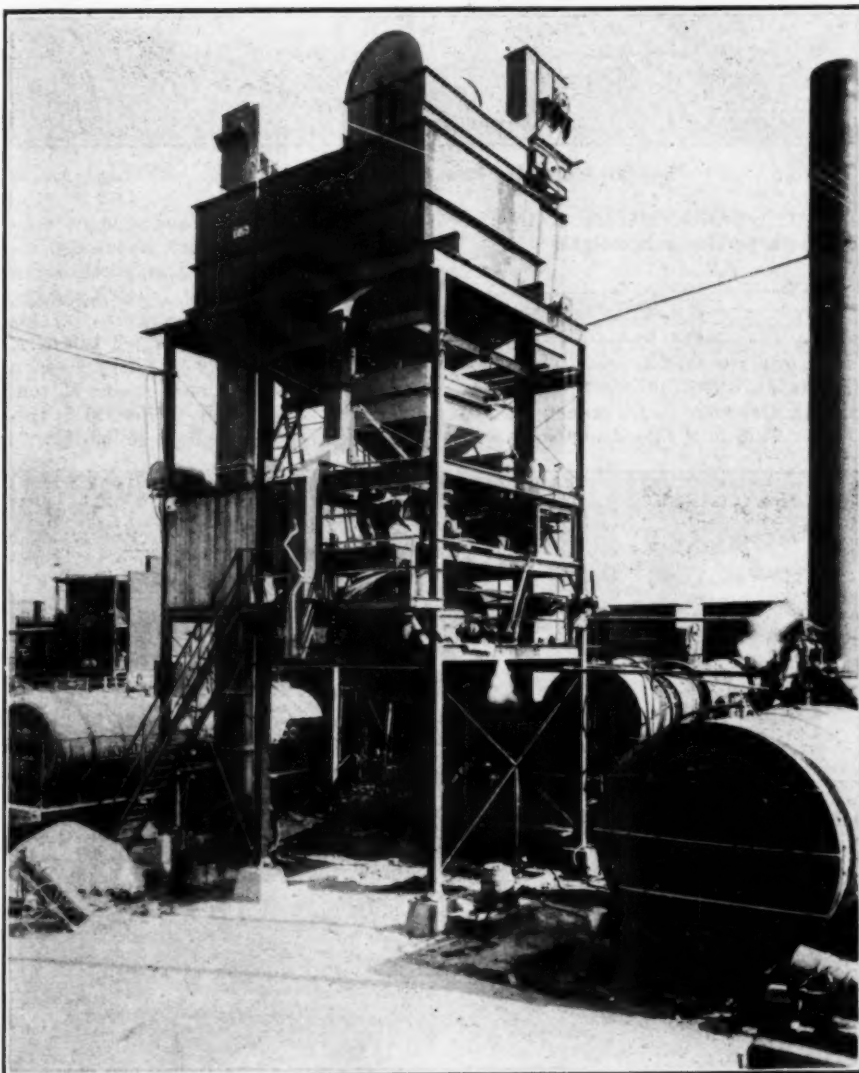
General View of Asphalt Mixing Plant of Bridges Asphalt Paving Co.
